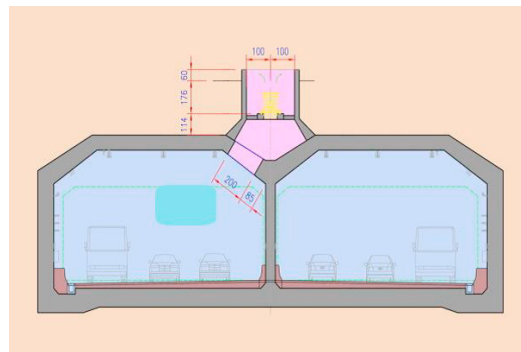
Schematic diagram of semi-lateral ventilation of Seyuan Road Tunnel
